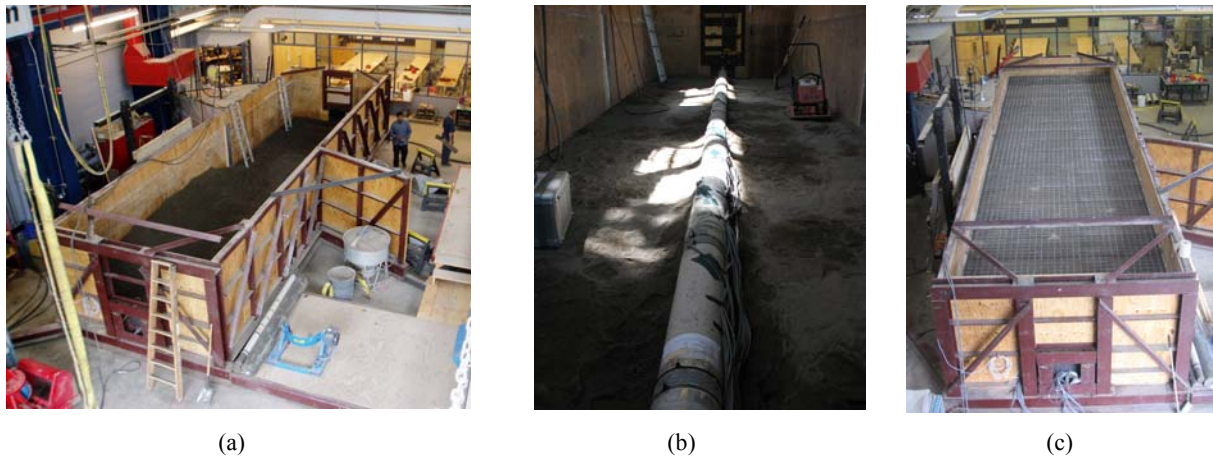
(a) Empty test basin with a thin layer of compacted soil. (b) Assembled segmented concrete pipeline prior to backfilling. (c) Fully backfilled and compacted granular soil in the test basin prior to testing.
